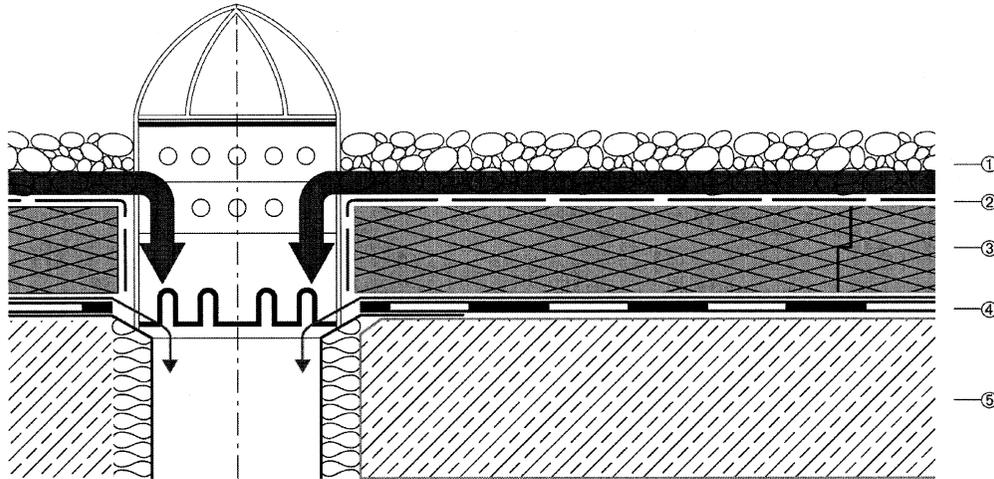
Inverted roof with water repellent separating layer above the insulation, water drainage into the roof outlet.
